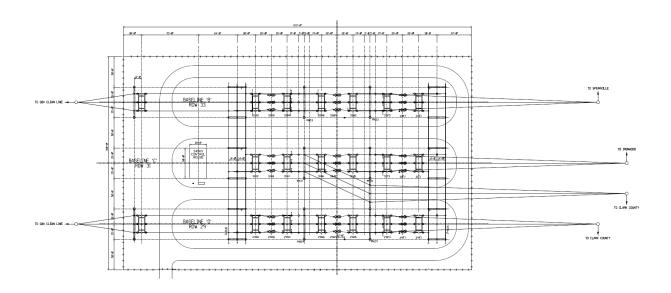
ITCGP GBX Clean Line Interconnection Substation Site Plan
